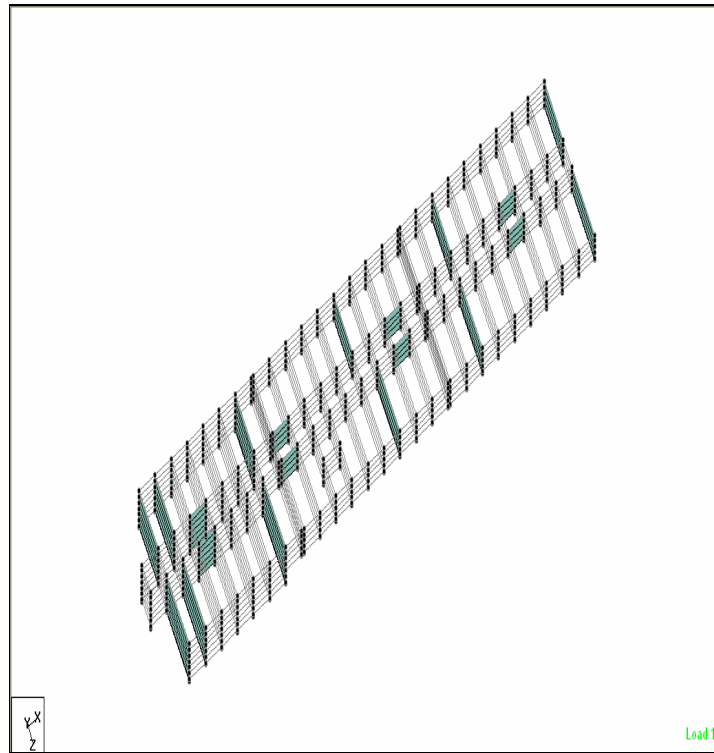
(A) : 3D MODEL OF BUILDING
